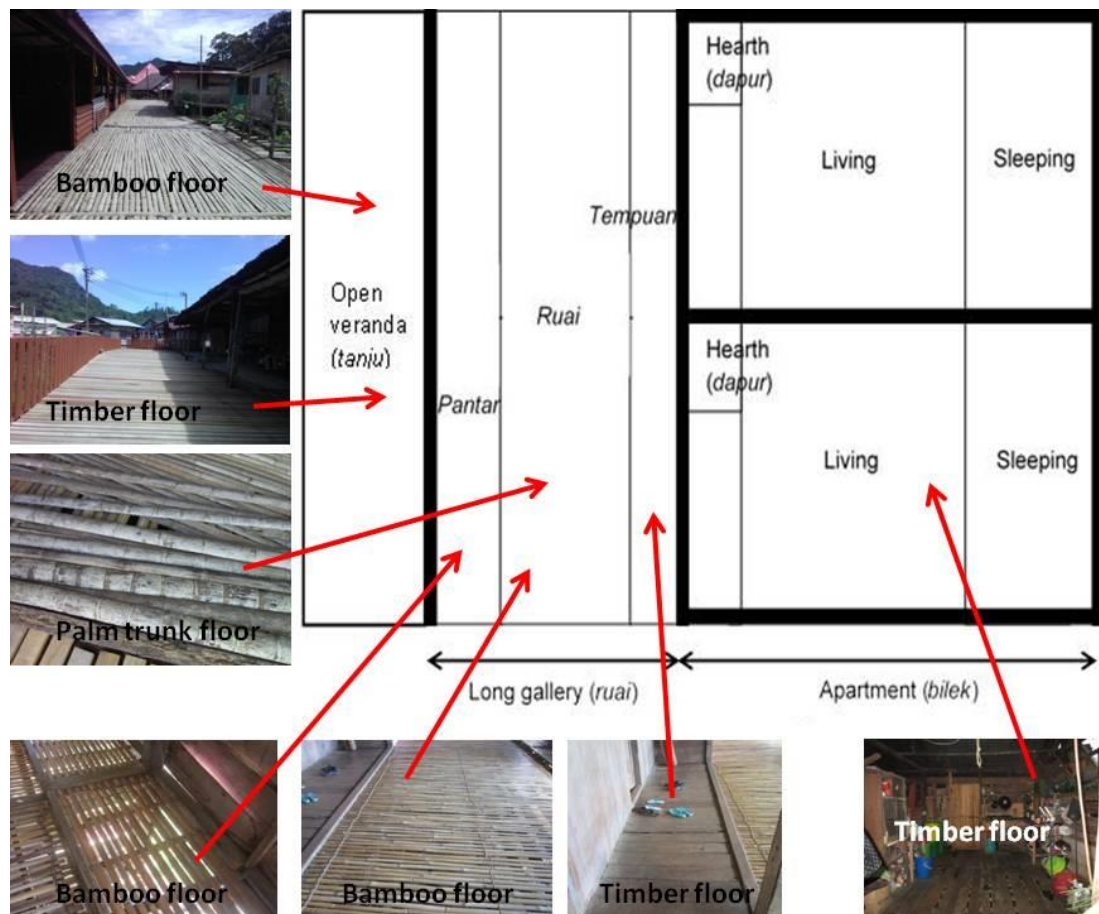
Traditional longhouse plan and materials used in the longhouse section.
